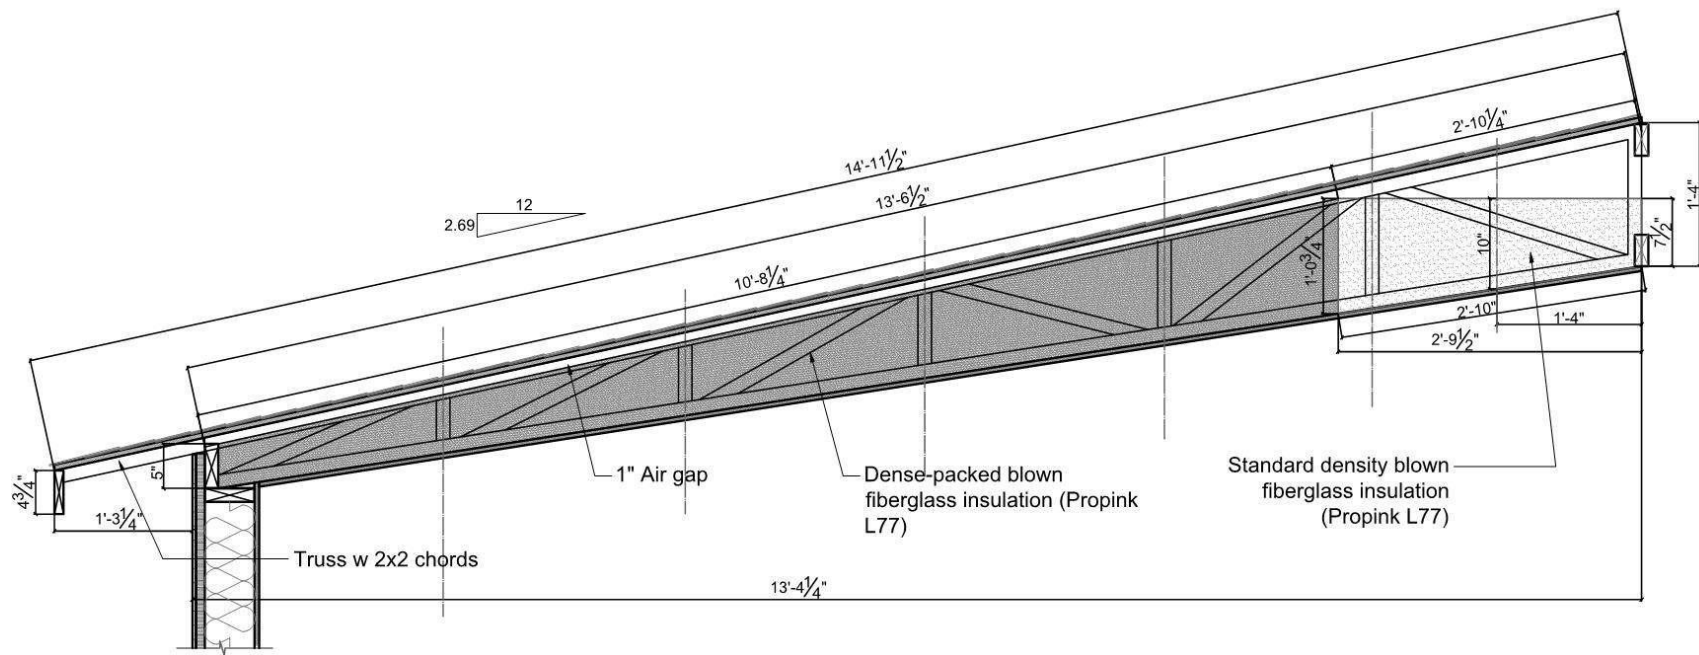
shows the construction detail at the eave of the advanced roof design and Figure 103Figure 94 shows the extent of dense-pack insulation in the cavity. A 1" air gap under the sheathing was accomplished through the use of prefabricated cardboard baffles.
